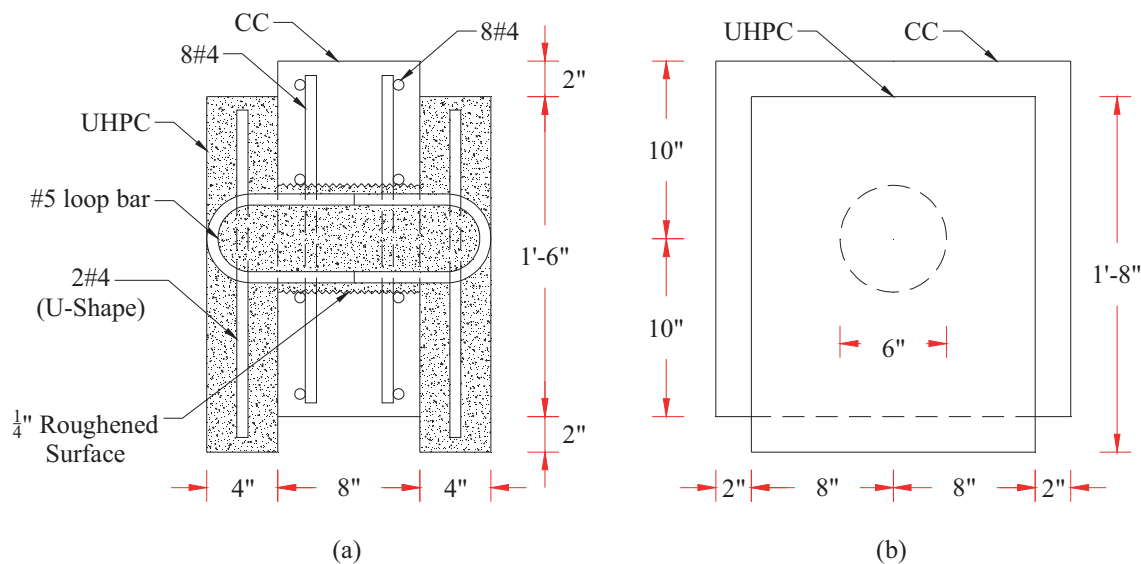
Double Shear Test Specimen Details; (a) Section Elevation, and (b) Side View.
